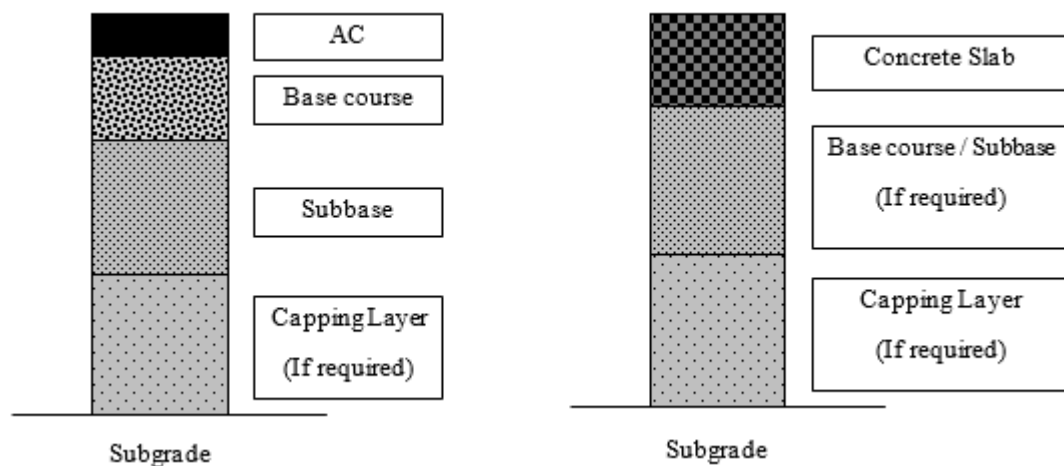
Cross sections of flexible Pavements and rigid Pavements
